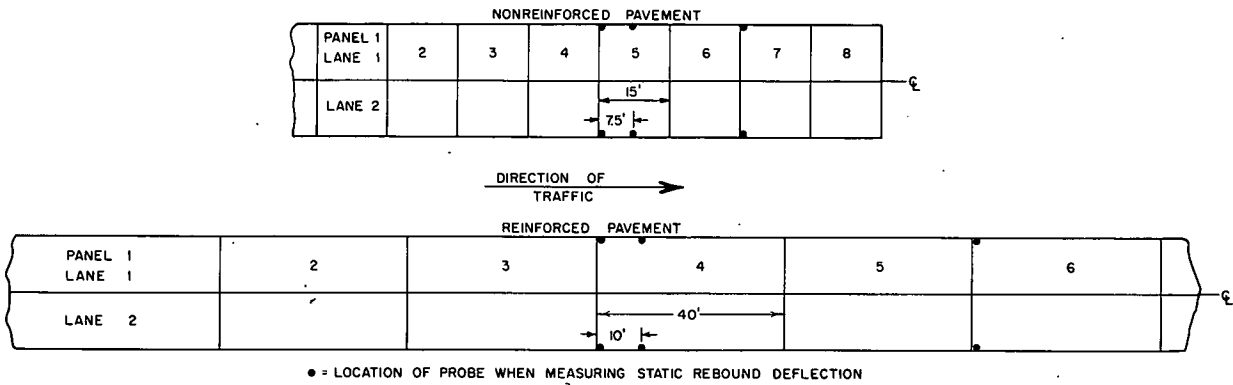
Plan of test sections showing normal locations for measuring static rebound deflection.
